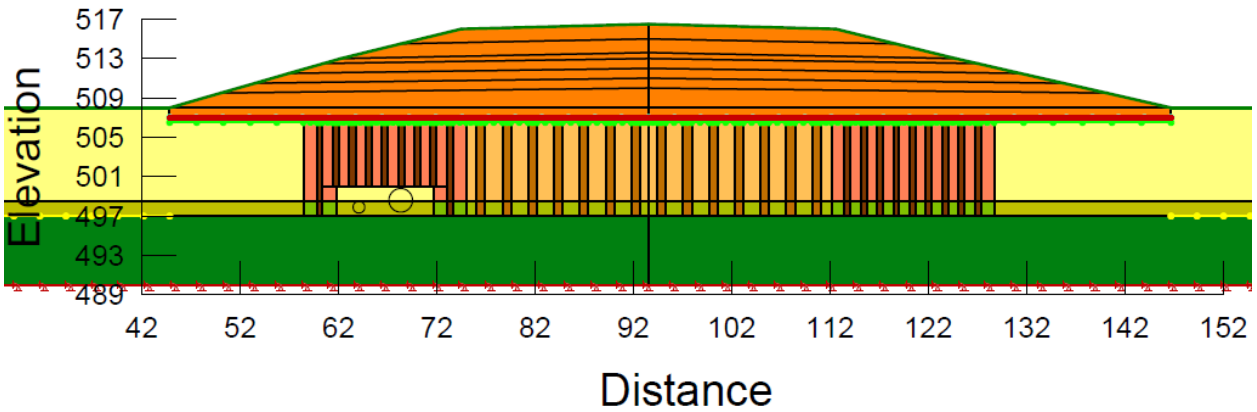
FEM South Abutment Cross-Section Model Completed Stage with Drainage Influenced Soil Zones
